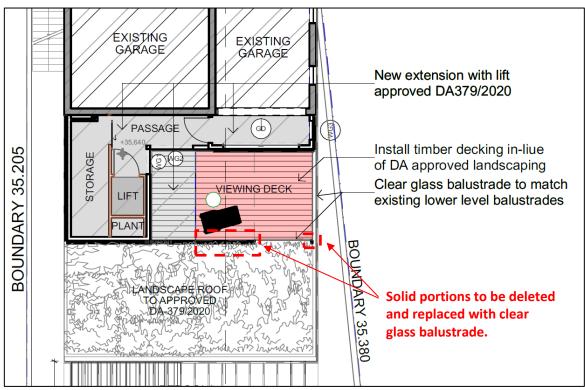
Extract of ground floor plan demonstrating solid portion to be deleted.
